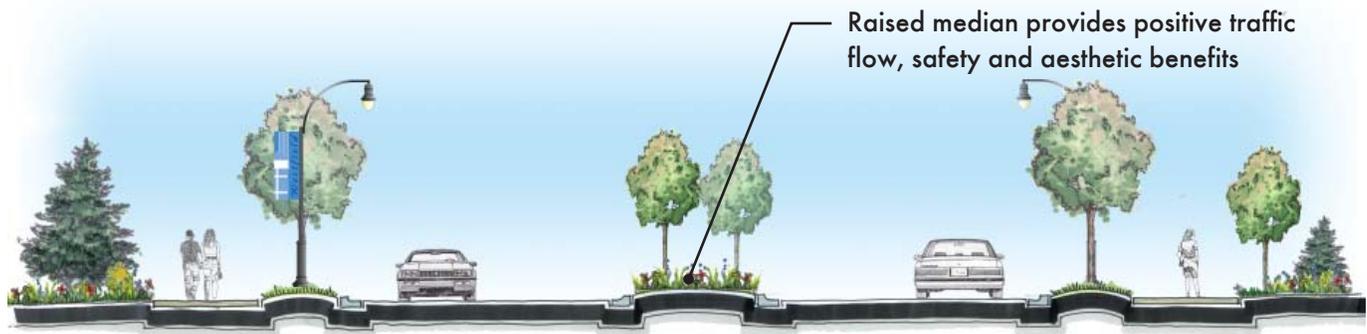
Typical corridor cross section utilizing raised medians to promote access management.
